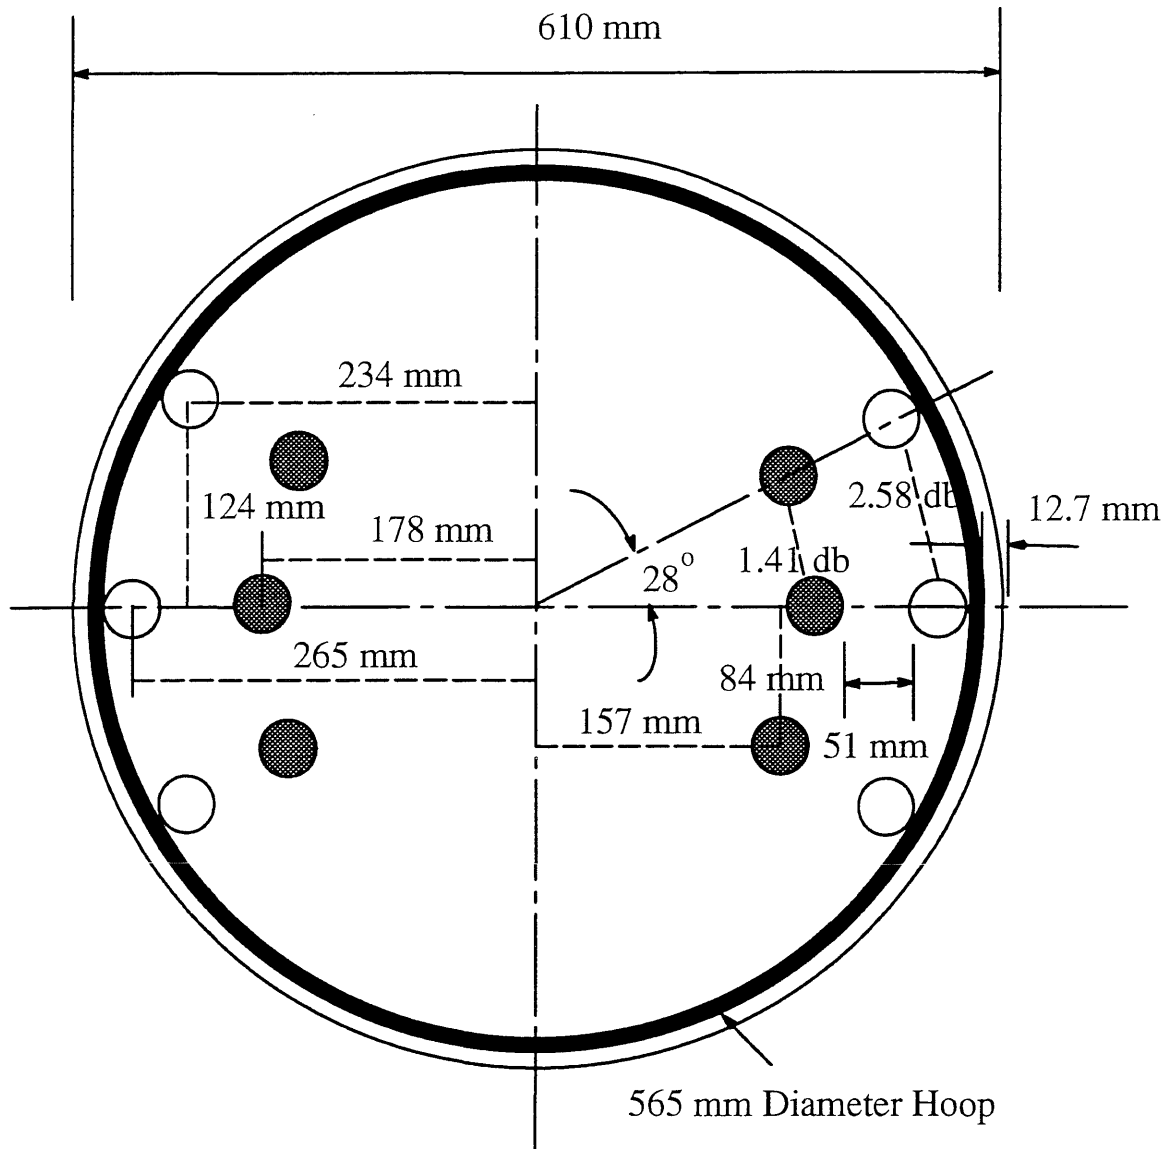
Cross Section for Column A-2 (L=51 mm, C=12.7 mm)
